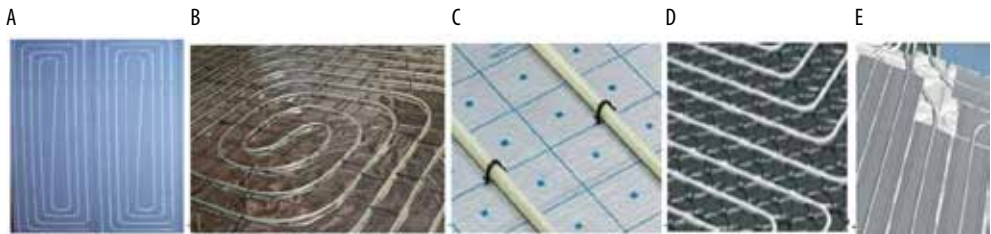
Examples of space heating systems (Source: R. Bilinskienė's private archive)
